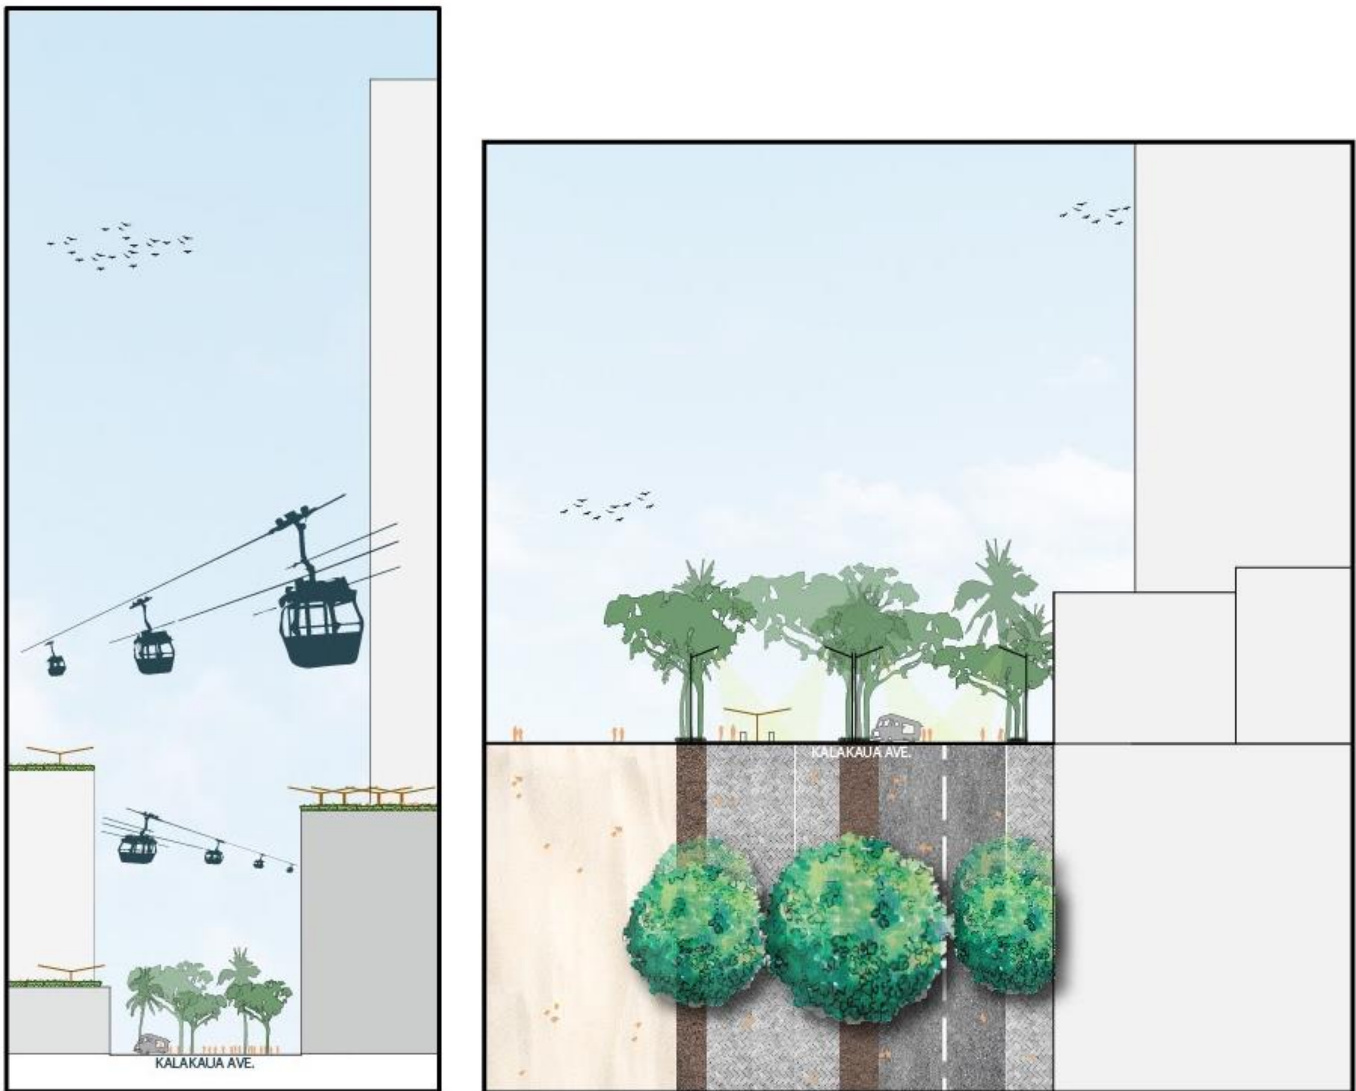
The Proposed Autonomous Street, Kalakaua Avenue
